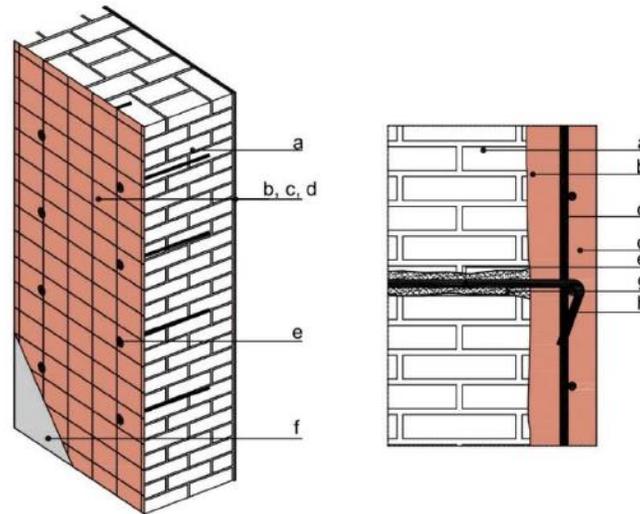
RC jacketing of an existing masonry wall: a) existing masonry; b) first layer of concrete; c) steel wire mesh; d) second layer of concrete; e) steel anchors; g) hole in the masonry wall filled with epoxy resin or cementitious grout, and h) steel anchor with a 90 degree hook (Source: ALL Ingegneria and AIREs Ingegneria).
